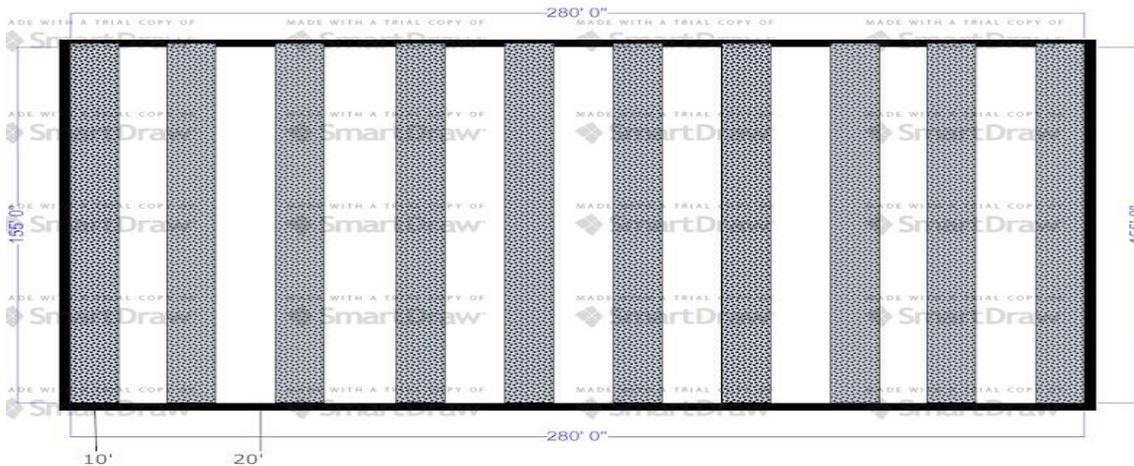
Initial engineered plan for restoration site included 10 shell rows that were 10 feet wide (white columns) and 9 bare bottom rows that were 20 feet wide (grey columns).
